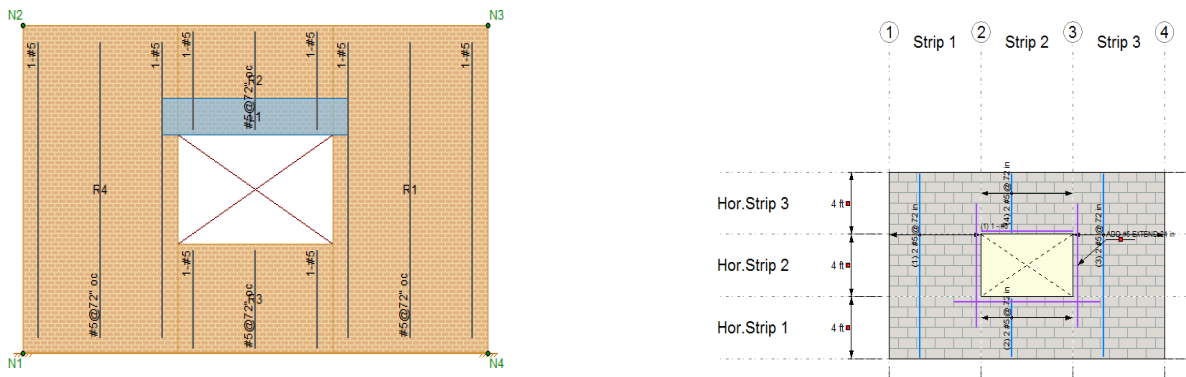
image above from RISA showing wall areas, image to the right of RAM Elements showing wall strips
